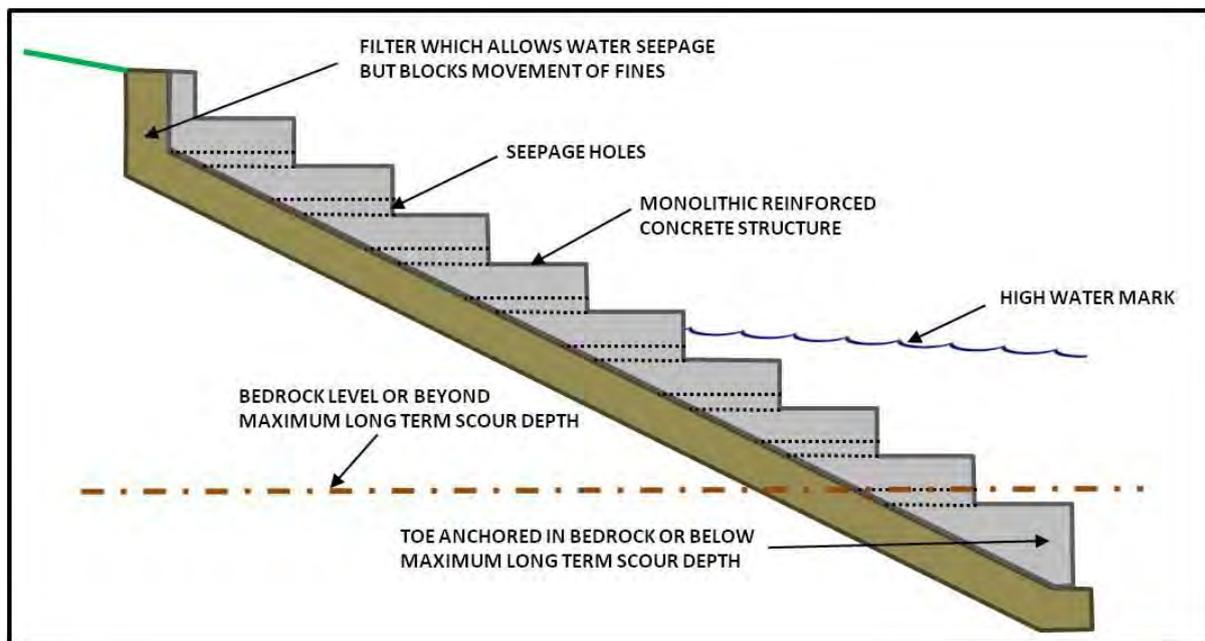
Design proposal 2 for the proposed Melck Street walkway: Concrete steps. Source: Common Ground Consulting (2013b).
